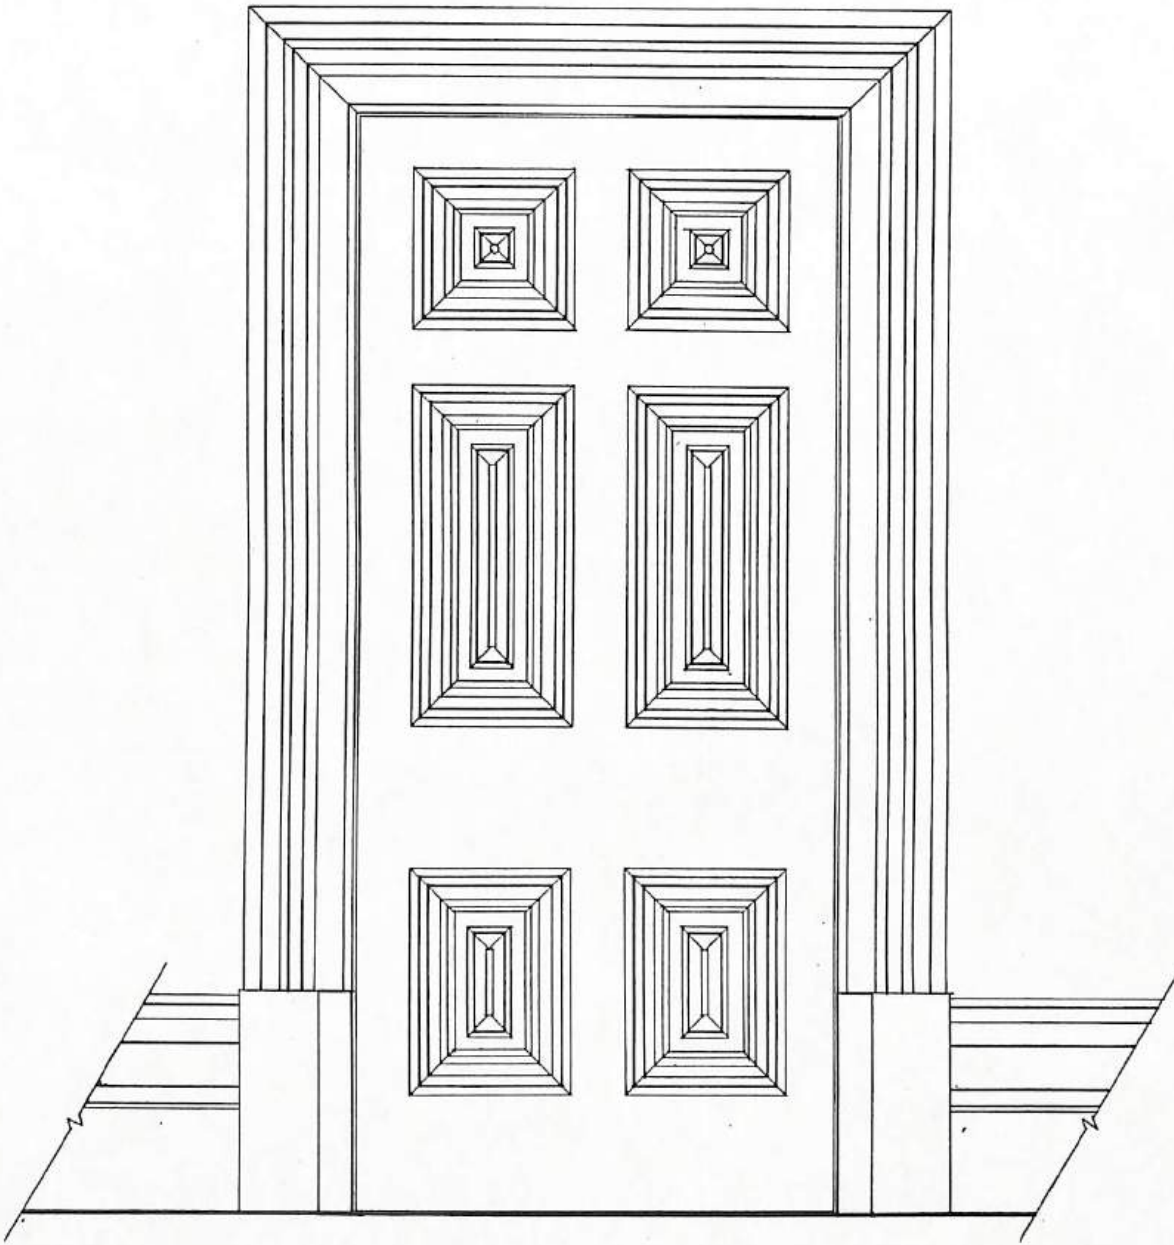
Measured Drawing, Door Panelling, Ground and First Floor Halls (RMIT)
